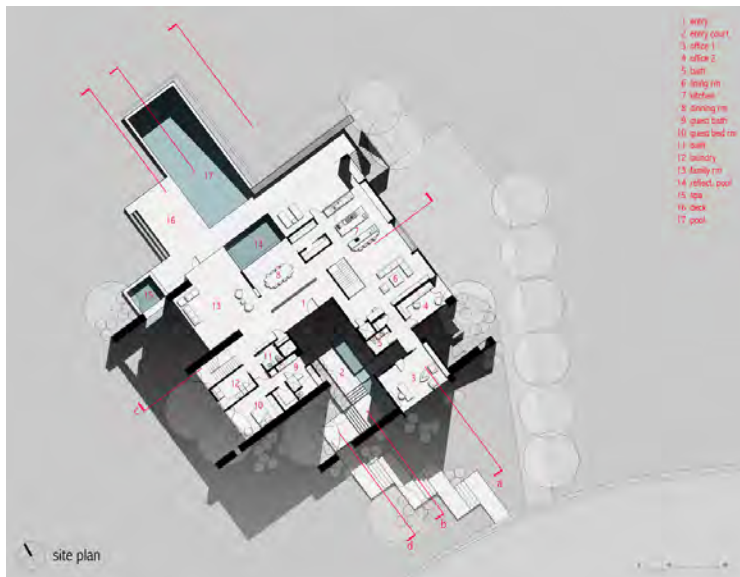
Main Level Floor Plan [Image by AssemblageSTUDIO]
